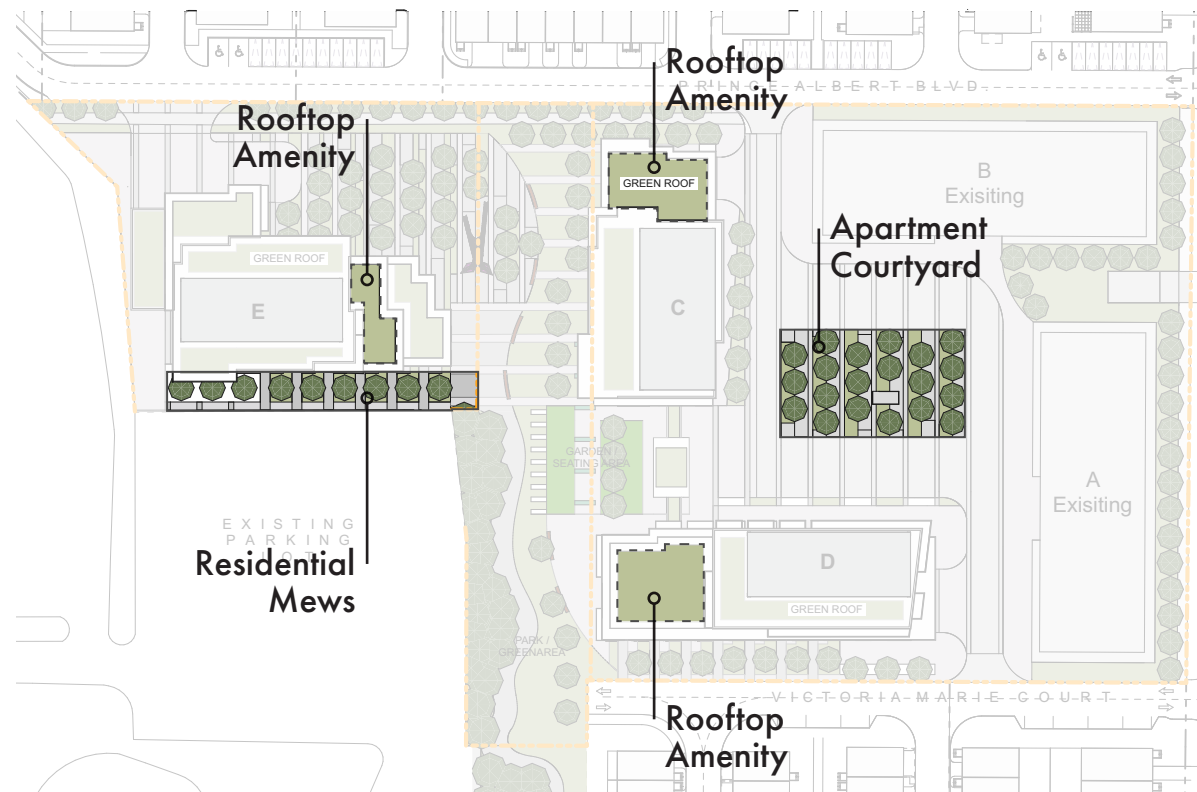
Ground floor and rooftop amenity spaces for individual building residents
